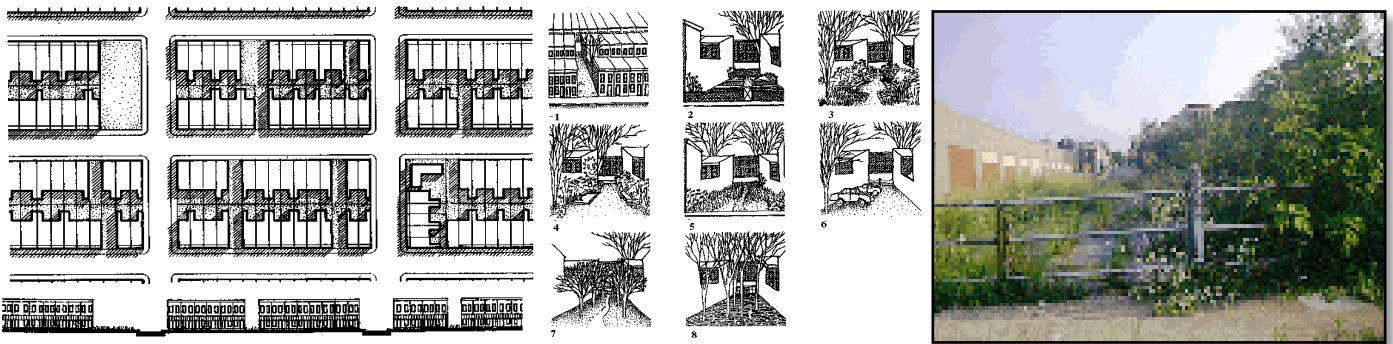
Picture and Plan showing Connectors Vacant Land
